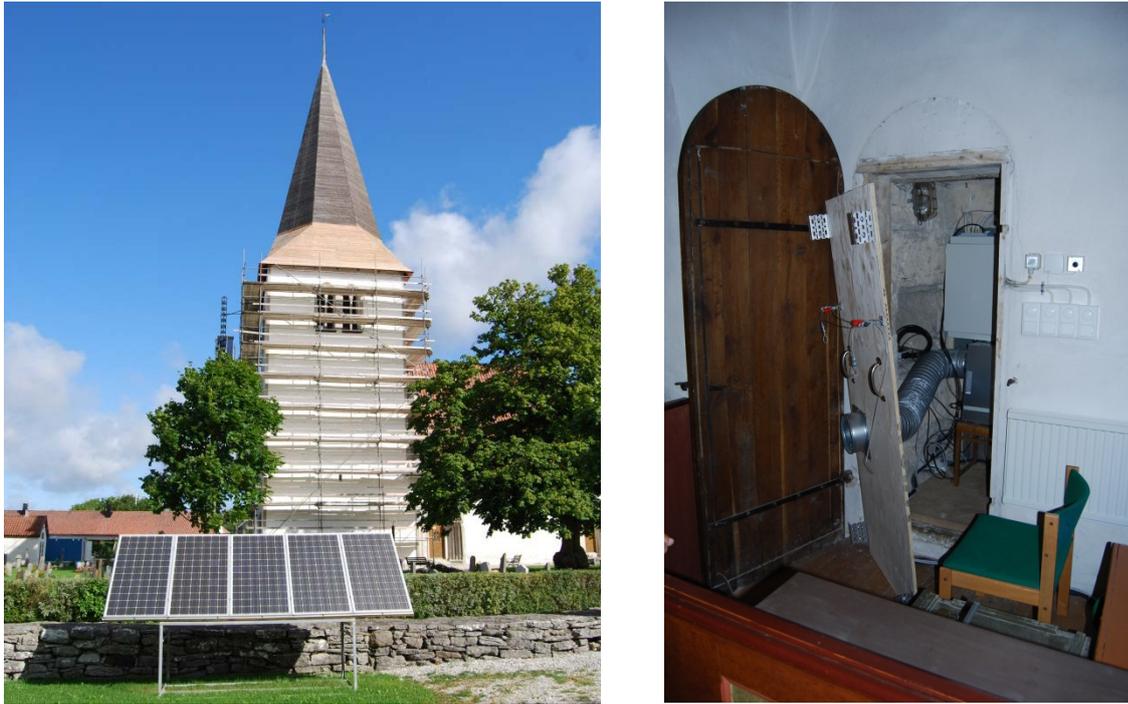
Hangvar church with the photo voltaic elements place outside the churchyard and the temporary installation of the fan on the tower staircase.
